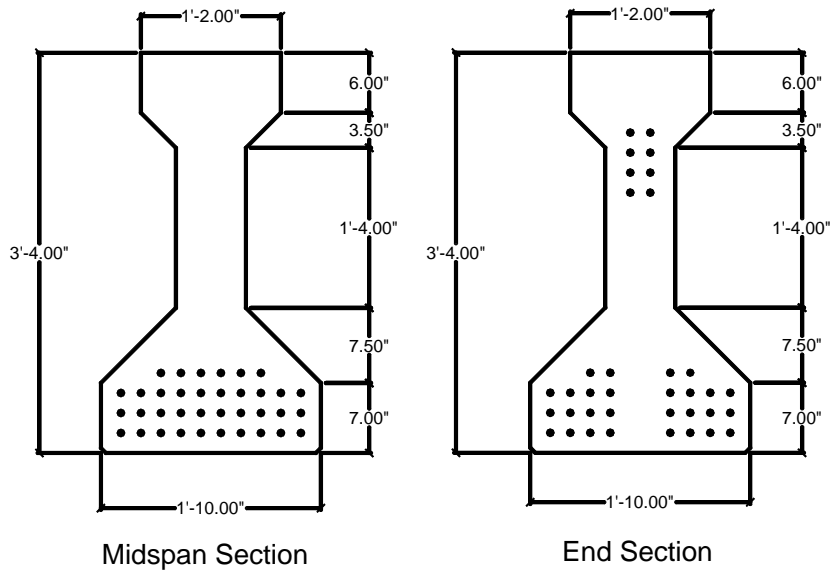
Type C Girders – Chandler Creek Bridge – 60' Span
